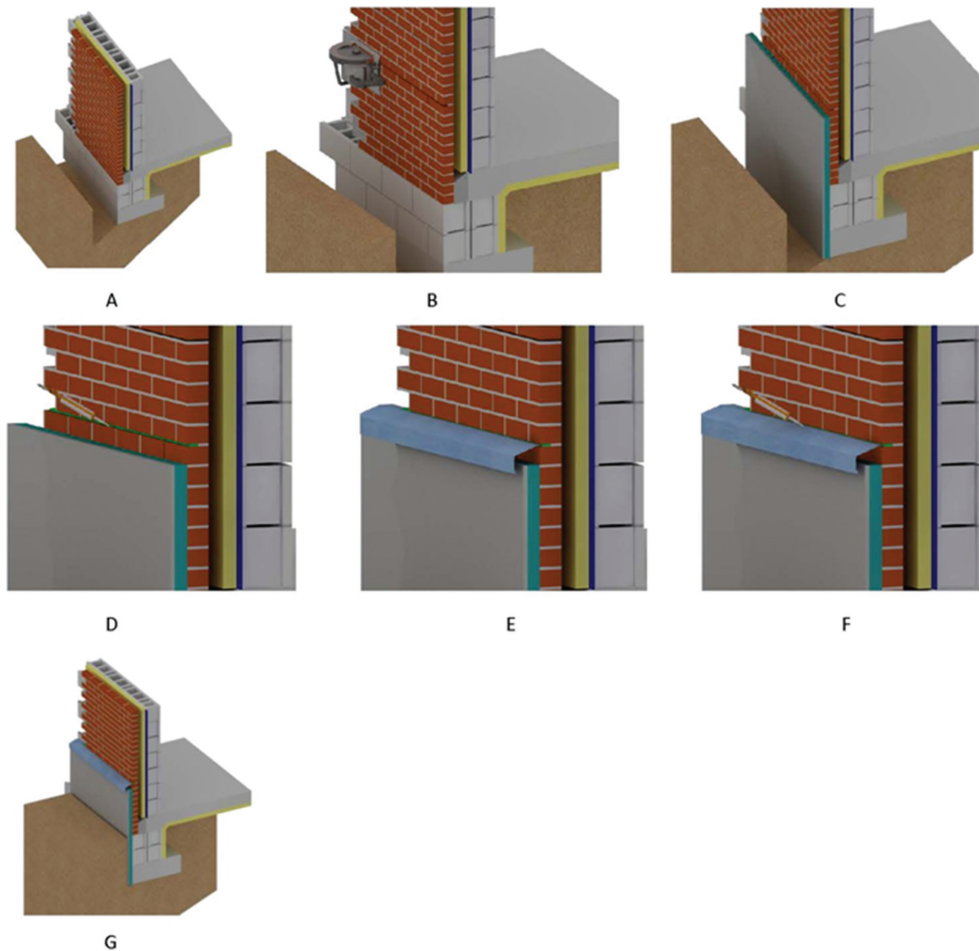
Foundation at-grade transition. CMU block wall with exterior insulation.
